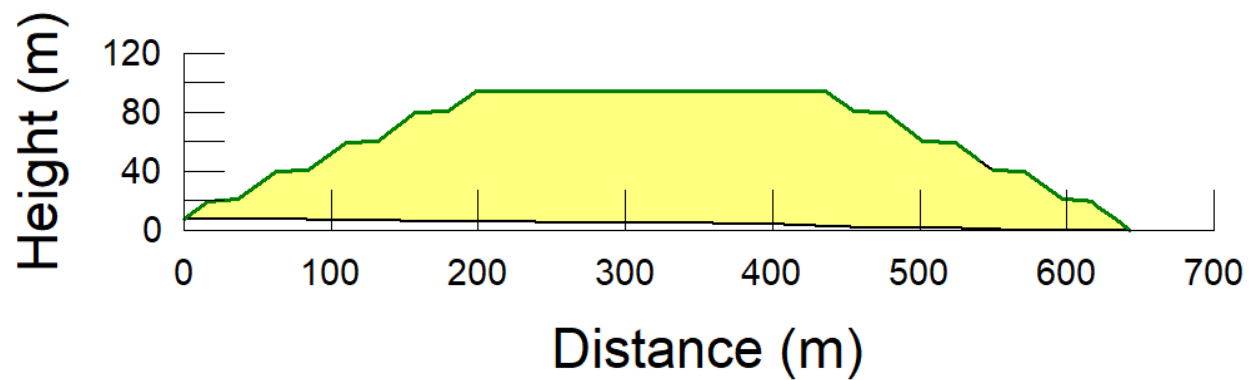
Northwest-Southeast cross-section through Whale Tail WRSF at closure (A).
